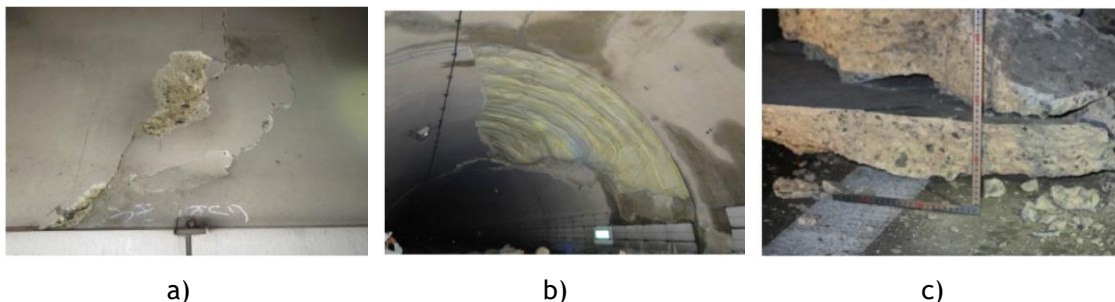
Spalling and collapse of concrete lining because of the seismic loading in the Tawarayama Tunnel, Japan. a) Concrete lining spalling along with inclined crack, b) large area vault collapse of crown; and c) concrete lining fallings [28].
